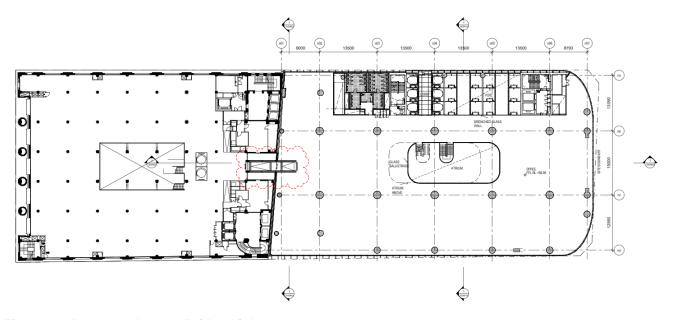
Proposed Level 8 Bridge Link - General Arrangement
